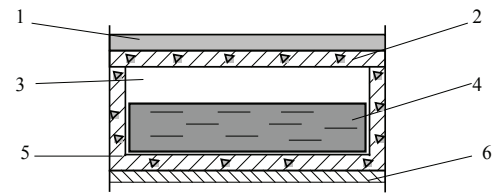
Scheme of foundation equipped with the cold accumulator: 1 – insulation; 2 – ceiling slab; 3 – ventilated channel; 4 – cold accumulator filled with water; 5 – concrete case; 6 – ground surface.
